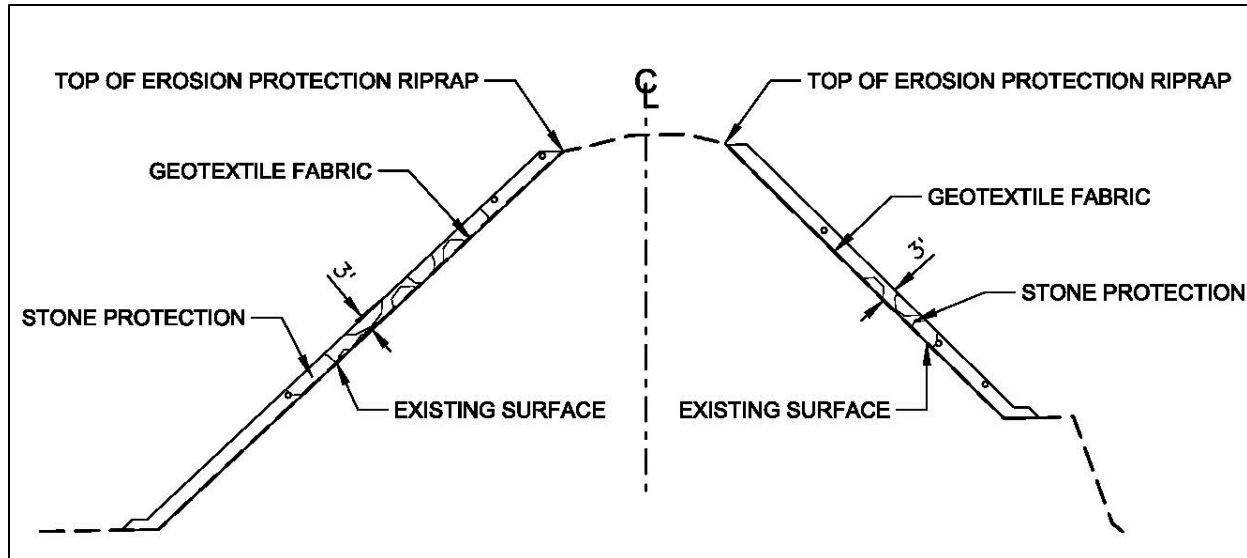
Bank Protection along Sacramento Bypass Training Levee.
